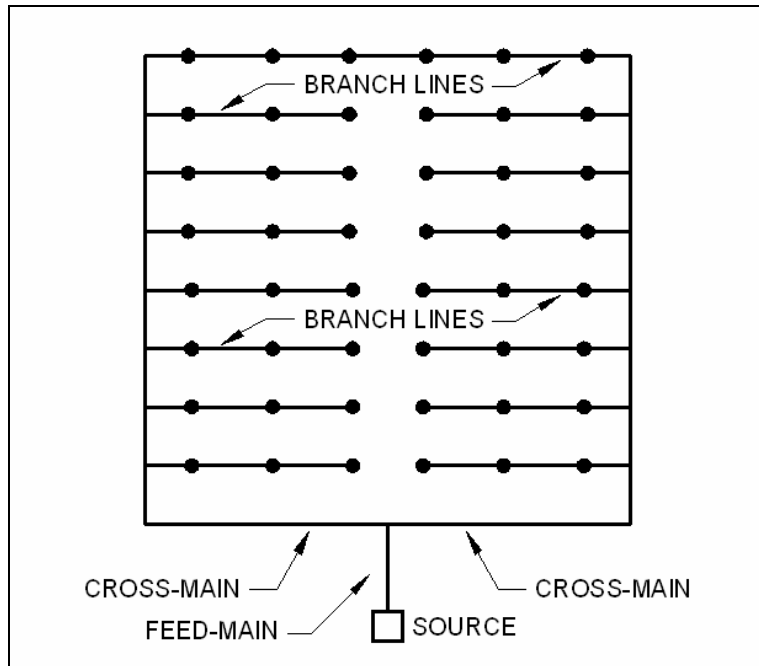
Typical Gridded Sprinkler System (Plan View)
